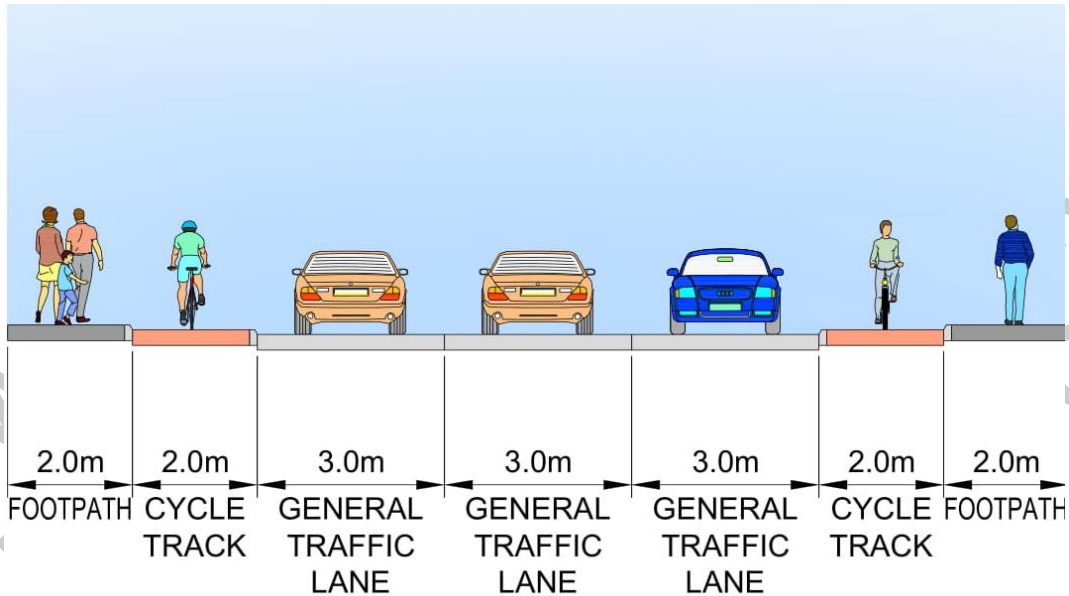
Section 2, Proposed Option 4a – Cross Section A-A
